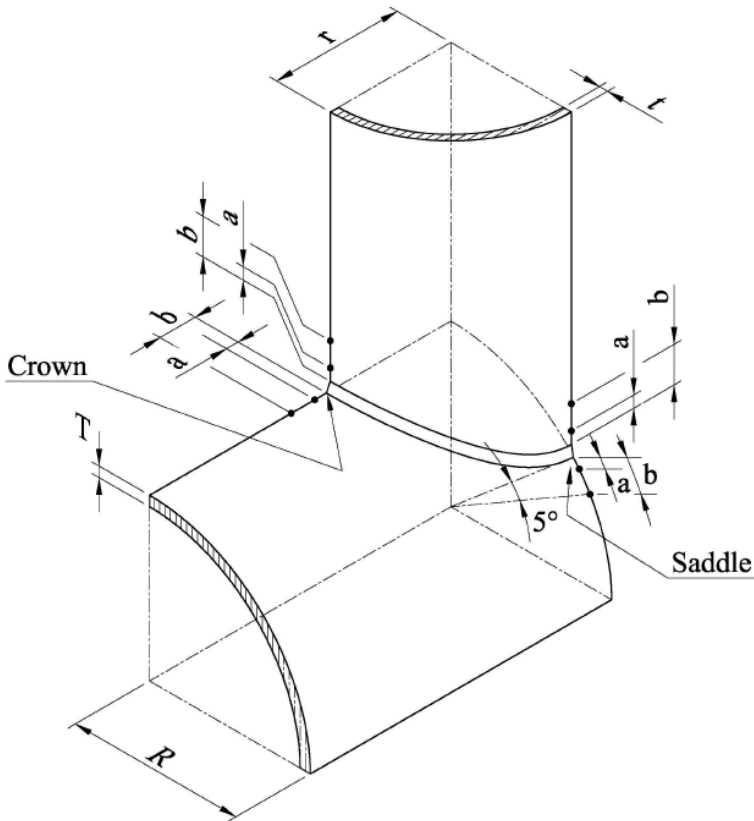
Segments around weld connection for read-out of stresses to be used in derivation of hot spot stress in tubular joints. (DNVGL-RP-0005 [15])
